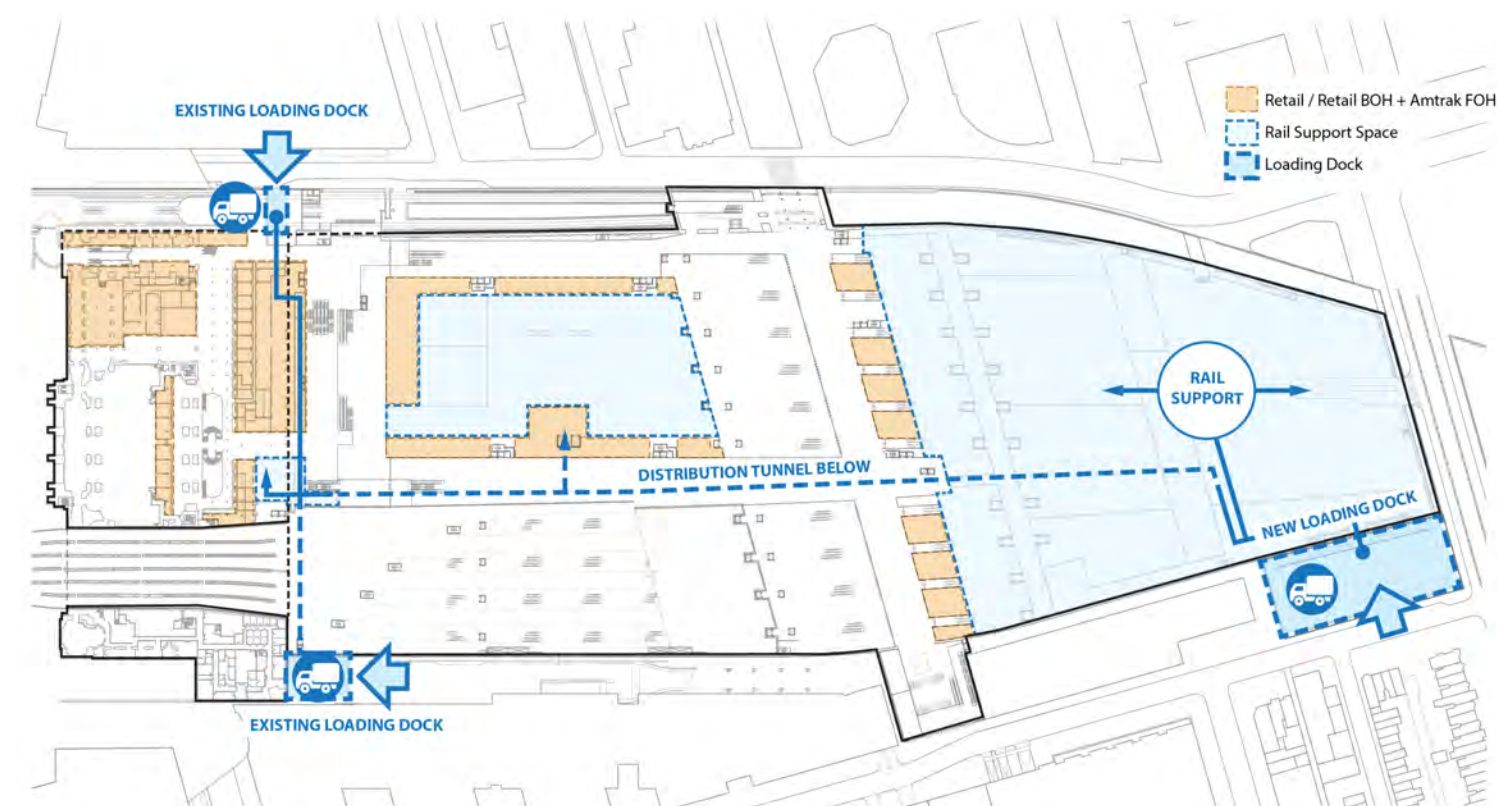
SCREENING AND LOADING AT CORNER OF K AND 2ND STREET
